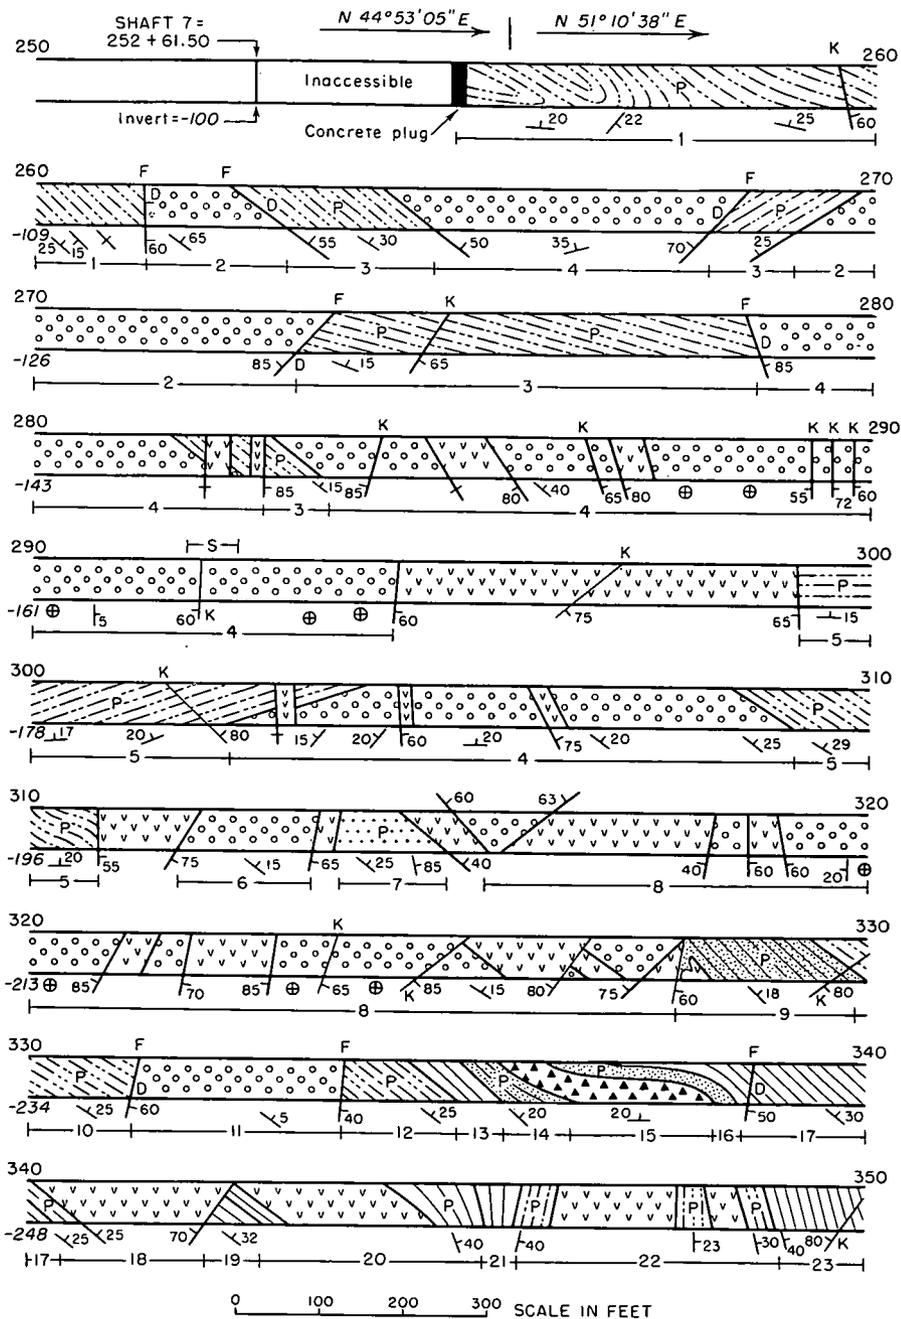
GEOLOGICAL MAP, SHAFT 7, (STATION 252 + 61.50) TO STATION 350 + 00. Bottom side of each strip is southeast wall of tunnel. Top of each strip is 50 feet northwest of southeast wall of tunnel, that is, 38 feet northwest of northwest wall of tunnel. Figures above each strip are stations. Negative figure in italics at lower left-hand corner of each strip is elevation of invert (bottom of tunnel), Boston City base. See Fig. 2 for meaning of symbols.
